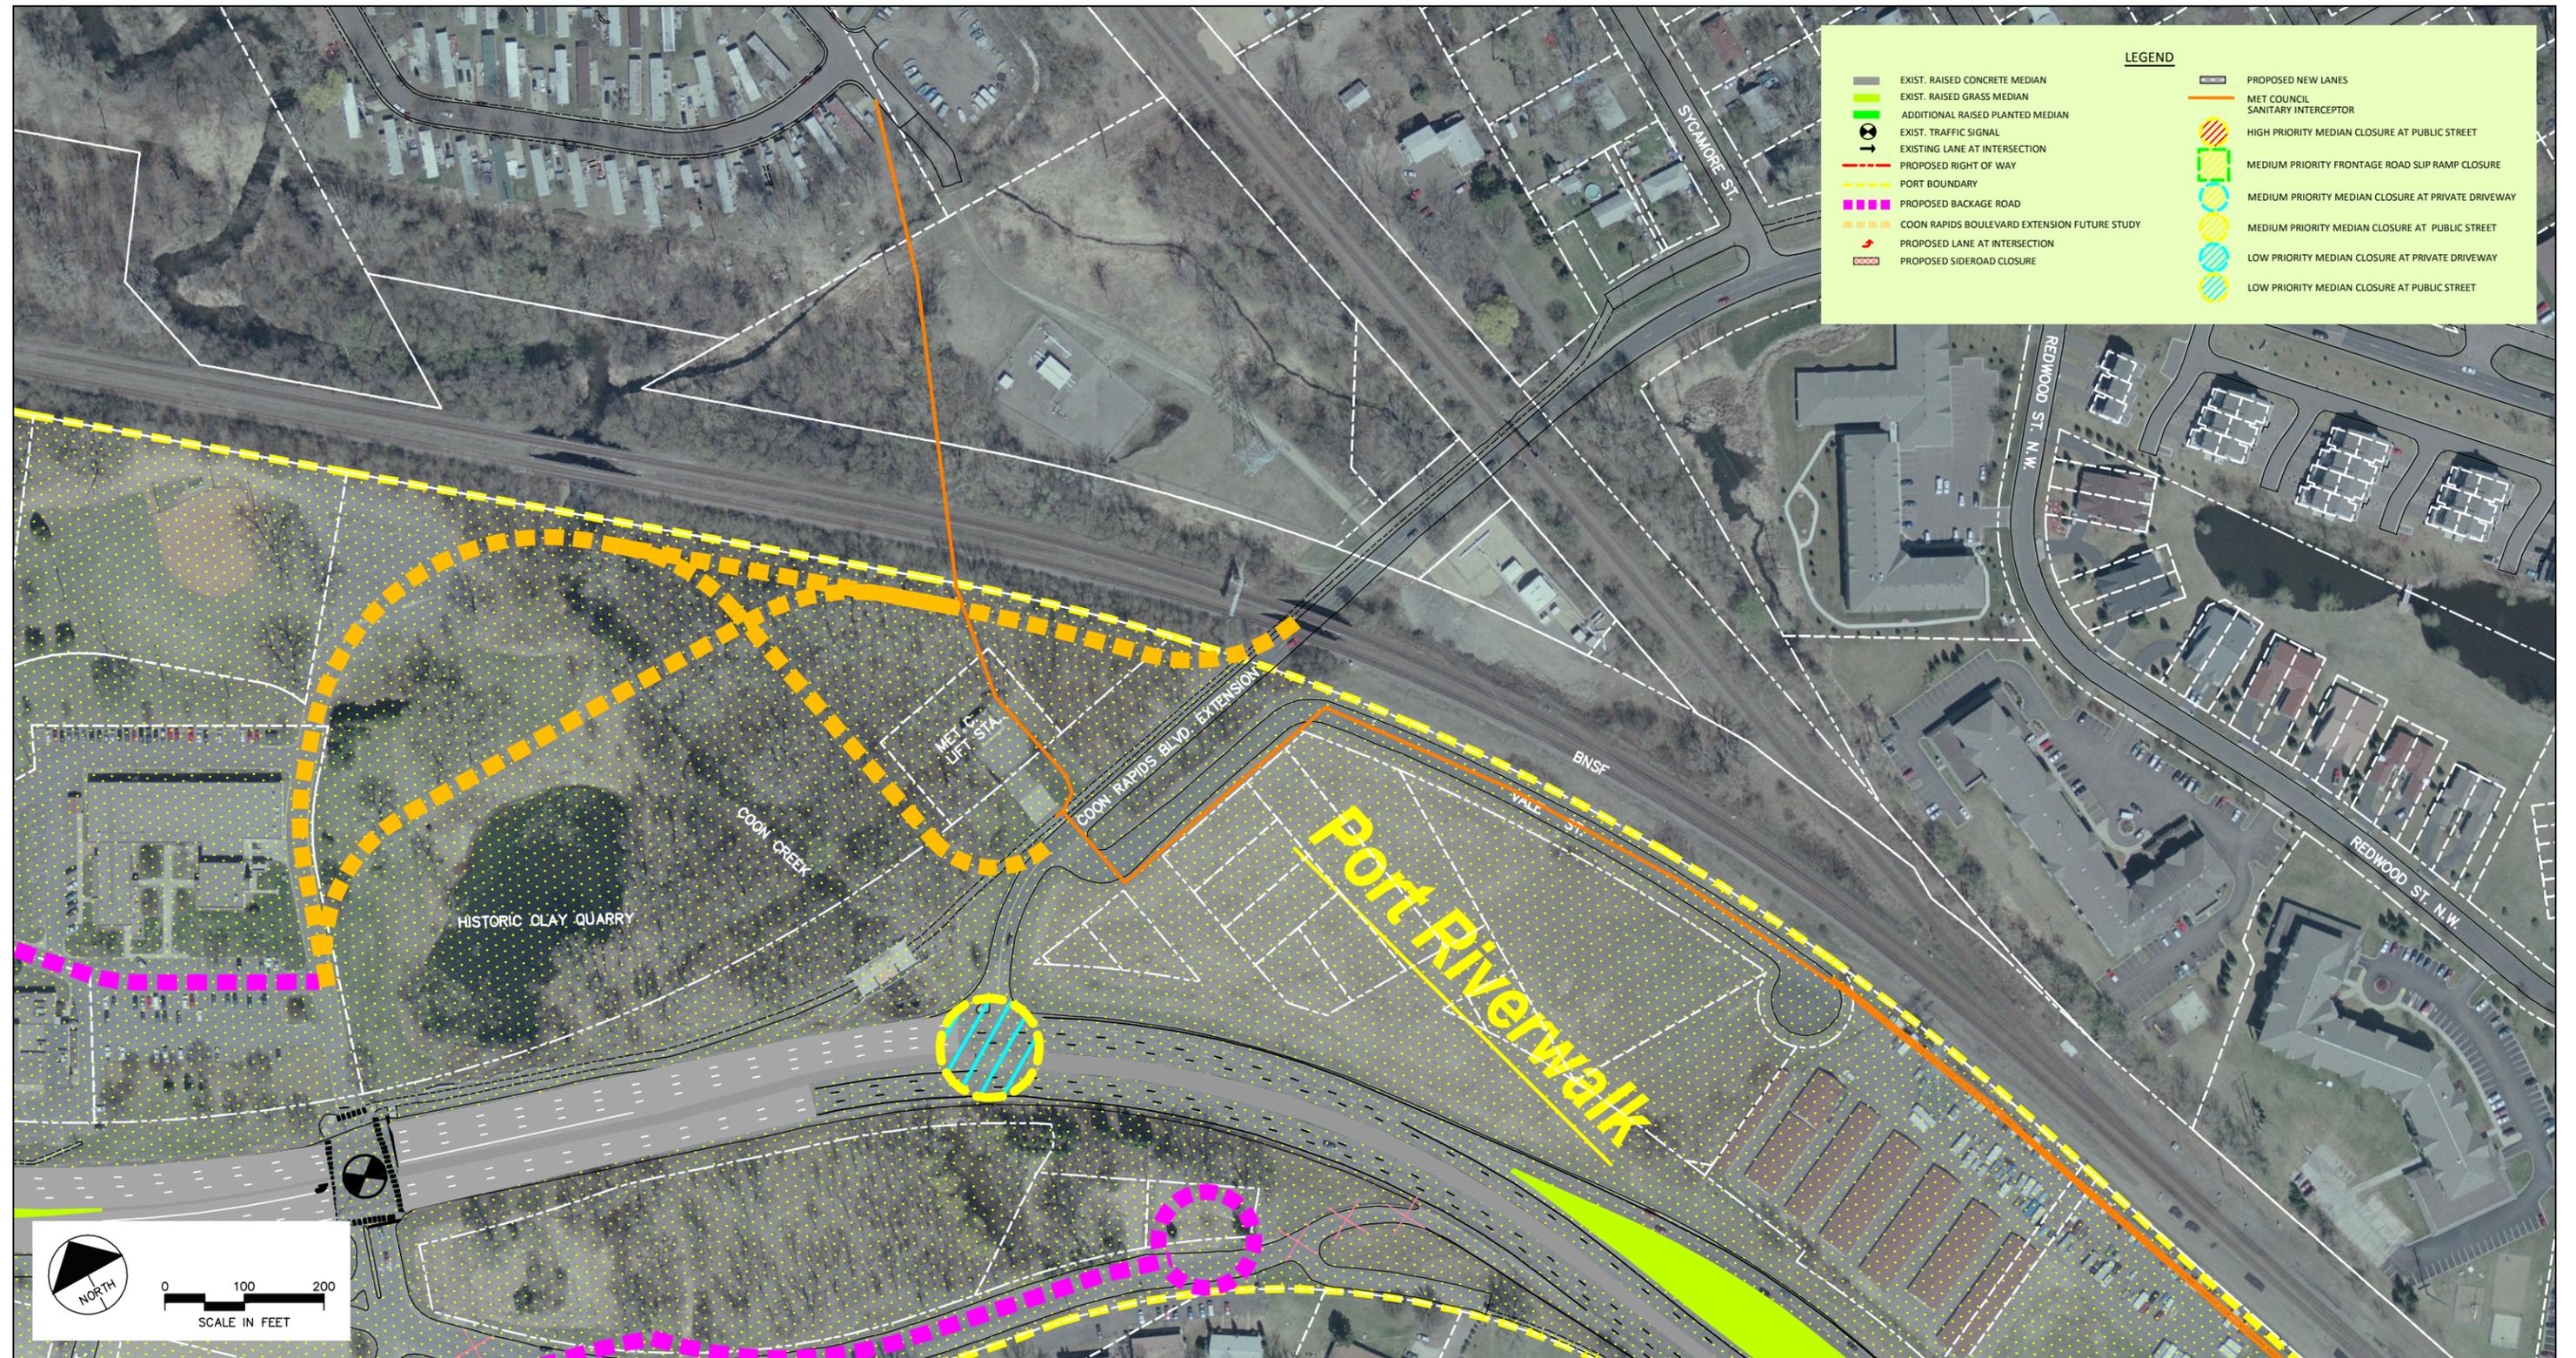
Proposed Roadway Recommendations Detail (11 of 15)
